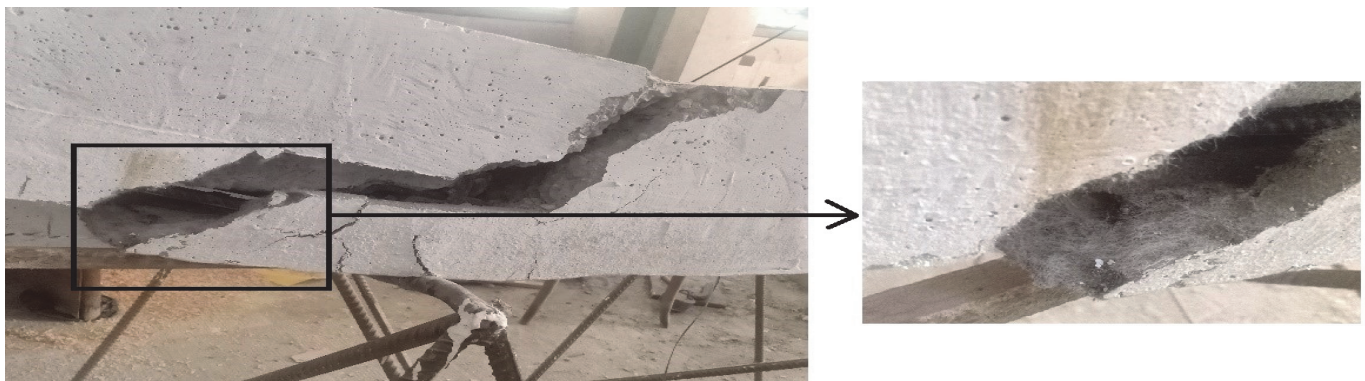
Concrete crack patterns at ECC beam (B 05) explain critical diagonal crack-induced debonding, Rupture failure at ECC plate and compression failure.
